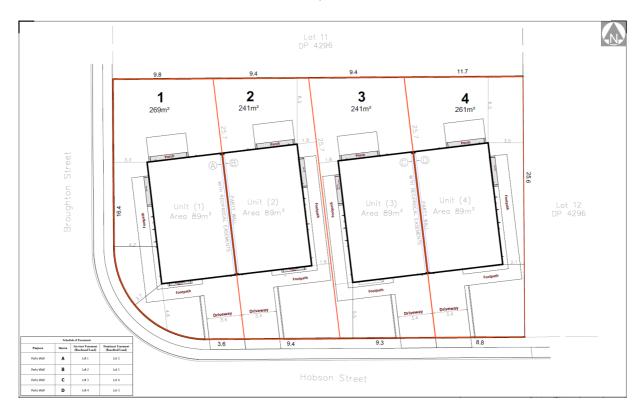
Proposed Scheme Plan illustrating the four lots and proposed development
